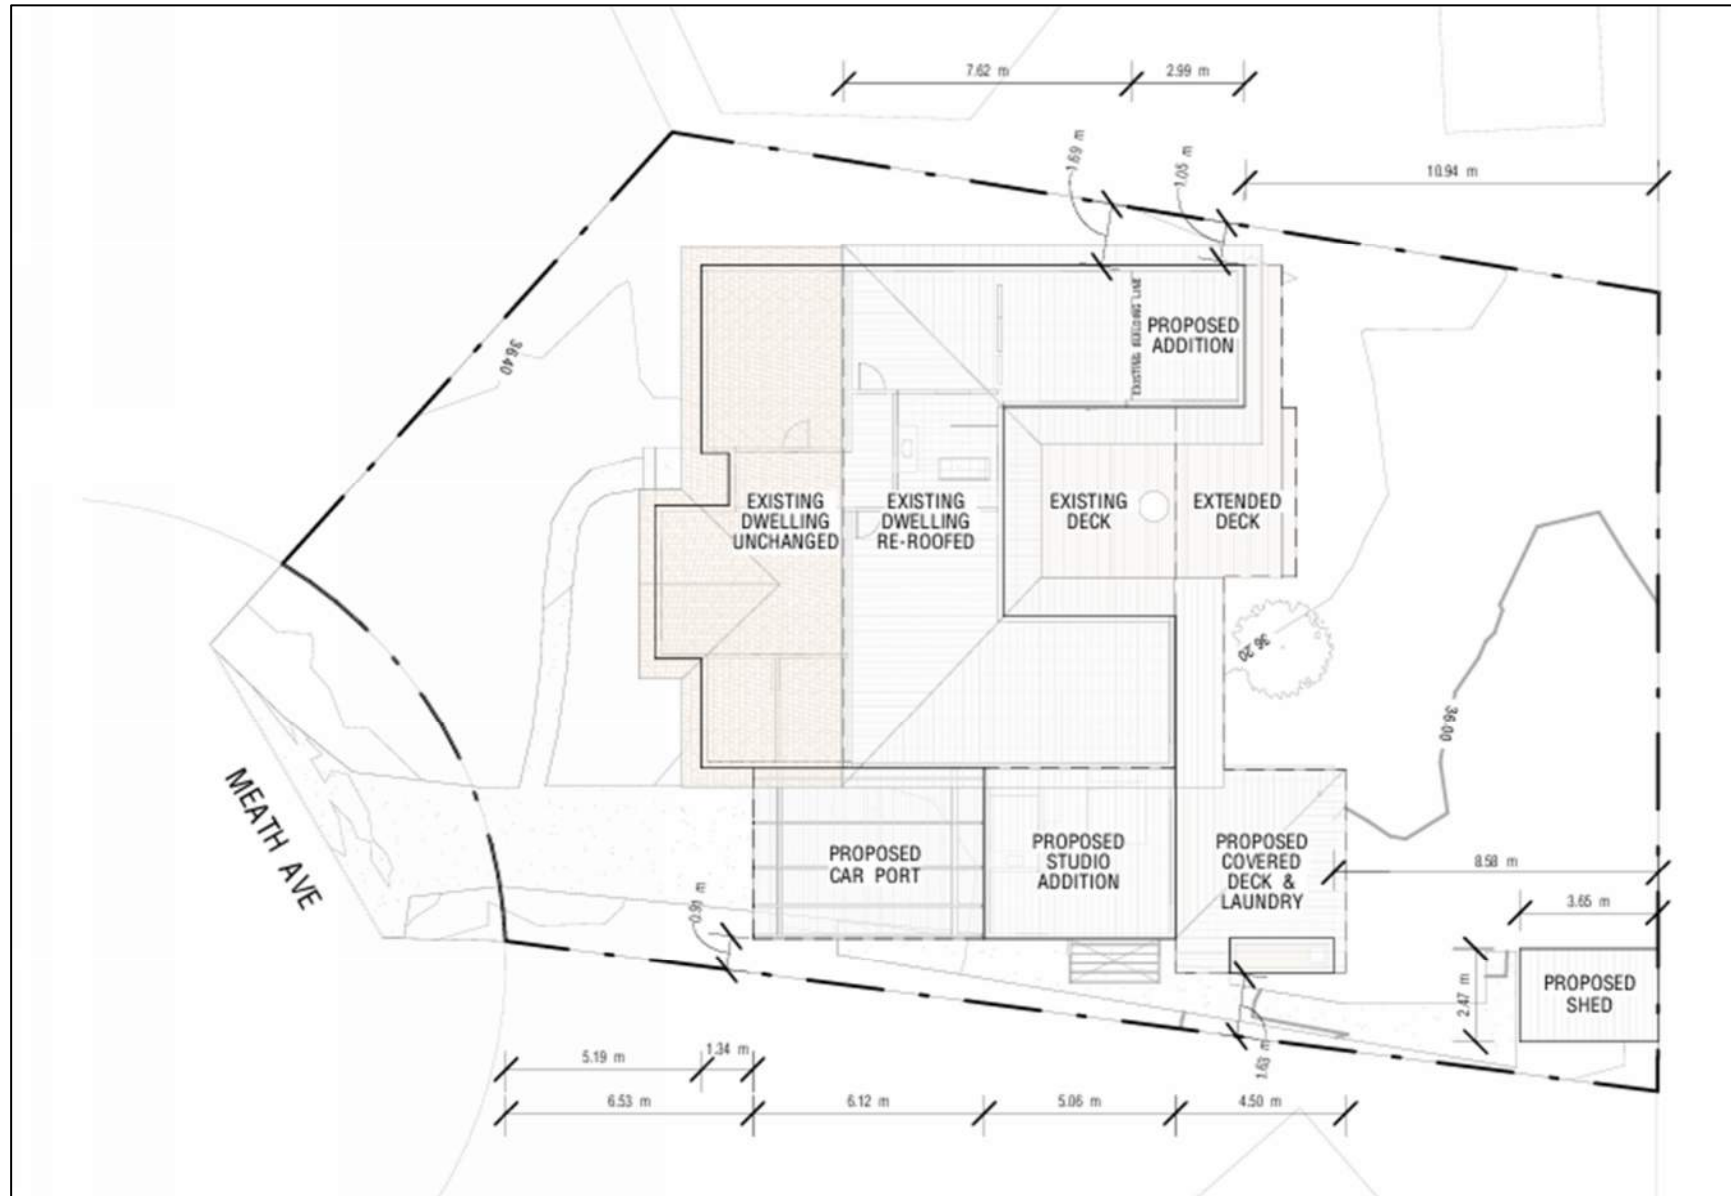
Site Plan showing proposed extent of works (extract from 'DA Architectural Drawings (1). 2023.10.20.pdf')
